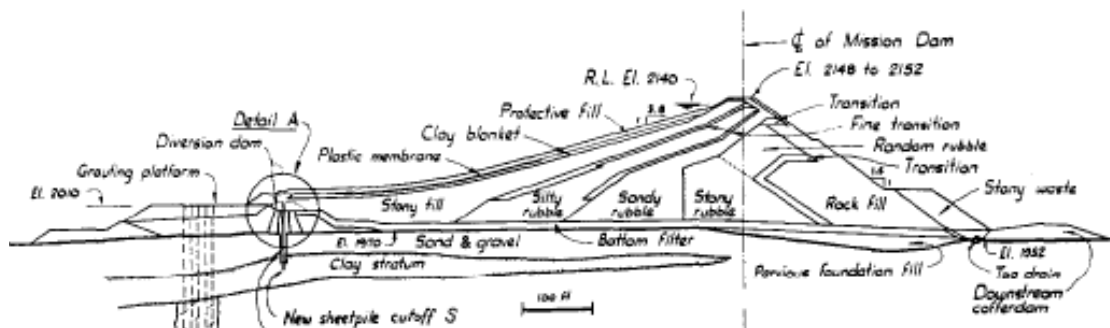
Cross-section of Mission Dam (Terzaghi and Lacroix 1964)
